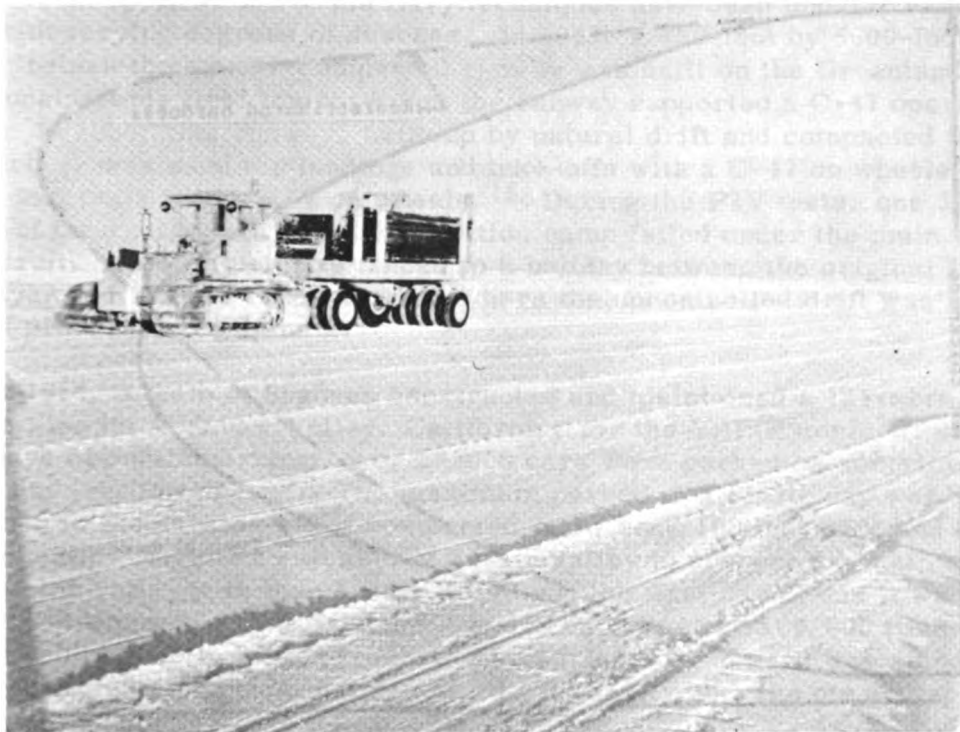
Thirteen-wheel 13-ton pneumatic-tired roller, surface-hardening roller.
